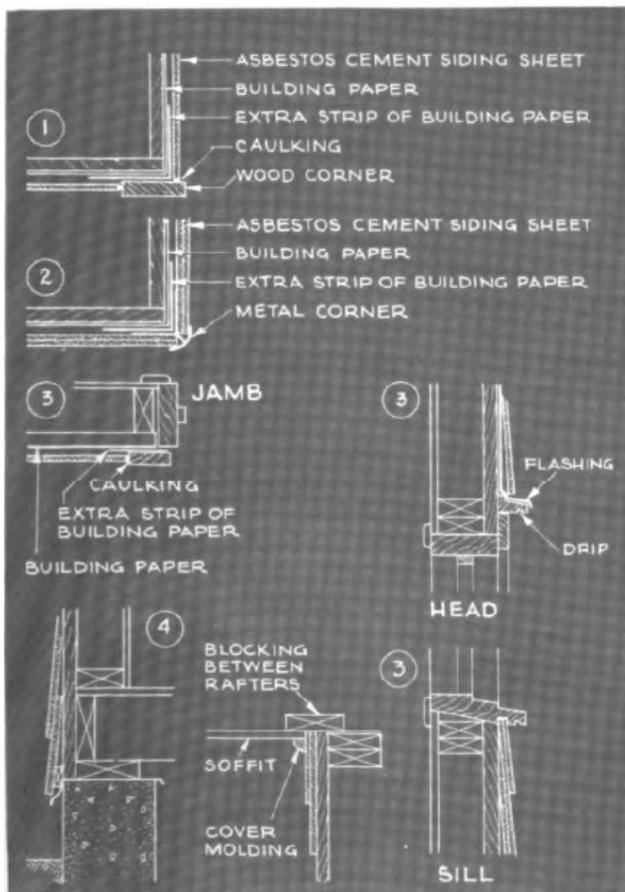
Details of external corners (1, 2); jamb, head, and sill at openings (3); at grade (4); and at roof overhang (5).
